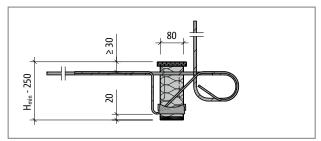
Schöck Isokorb® T type K-WO: Product section
